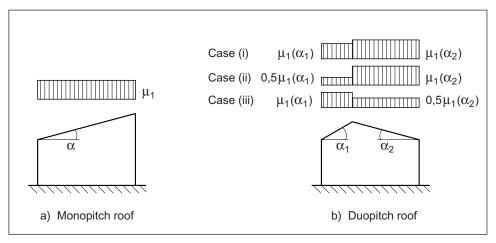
The load arrangements to be considered for monopitch and duopitch roofs [6,7]
